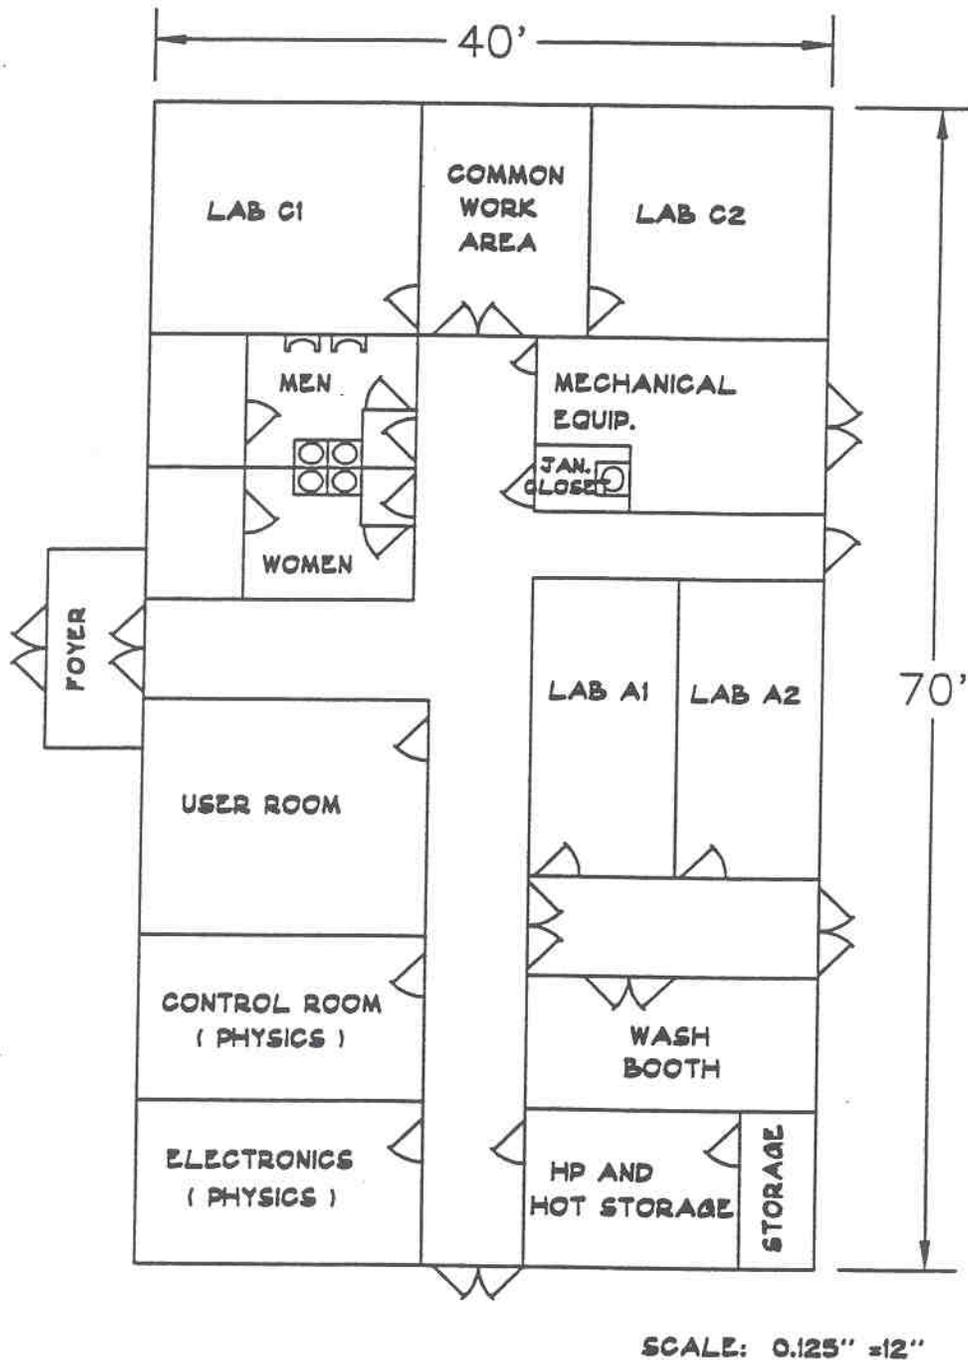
SUPPORT BUILDING PLAN
